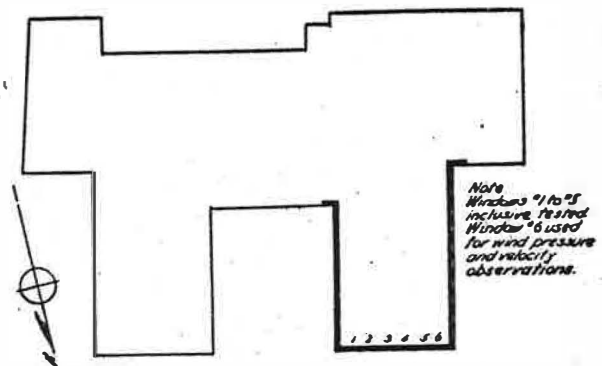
ELEVENTH FLOOR PLAN, SOUTHWESTERN BELL TELEPHONE BUILDING
